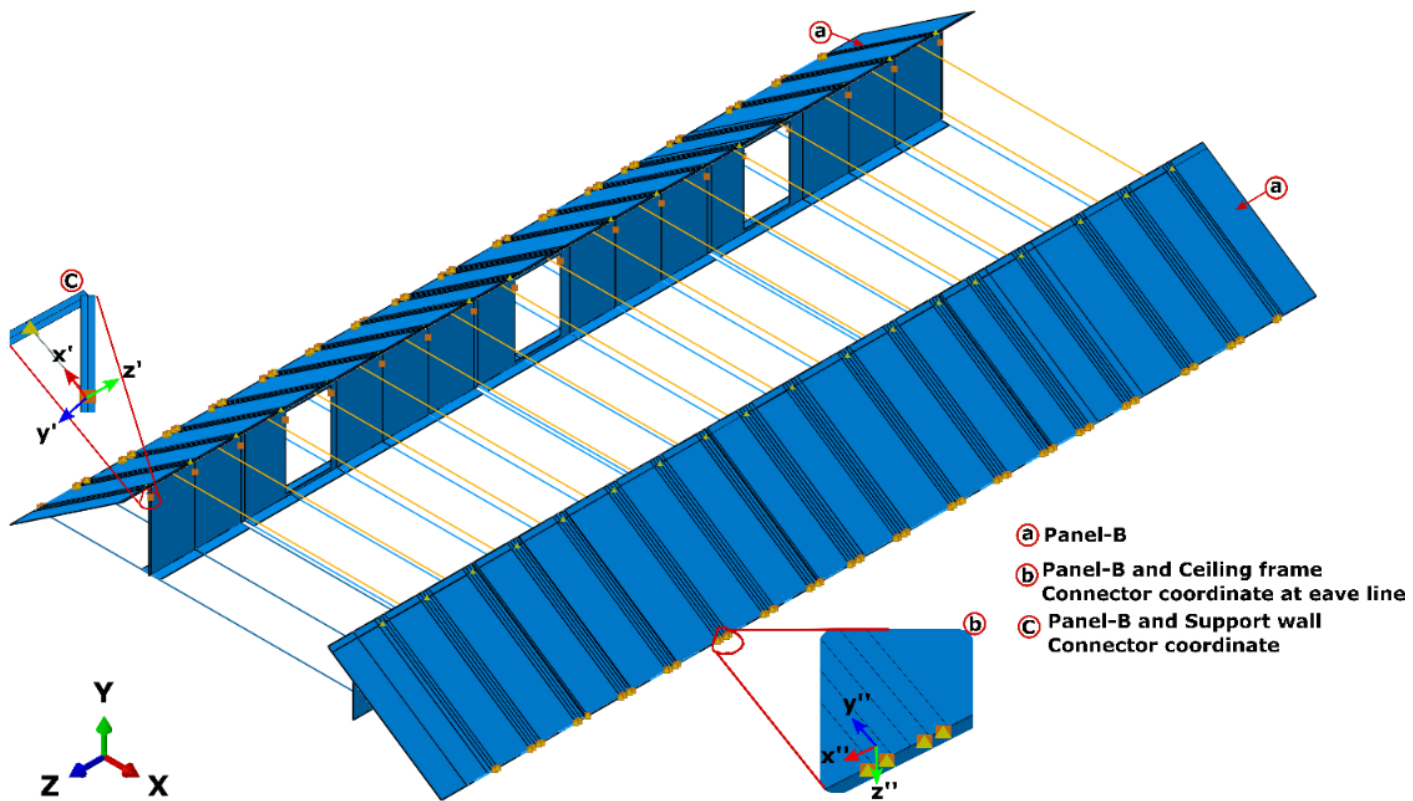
Partial model assembly with Roof panel-B, Gable ends, and Support wall.
